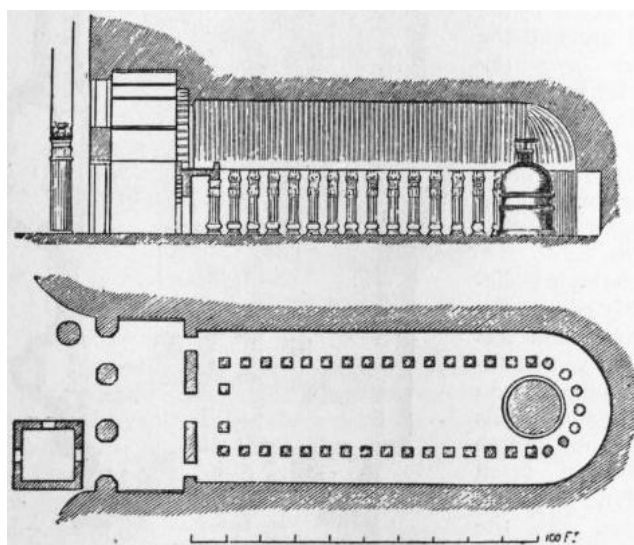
Cave at Kārli near Bombay. Section and plan.
